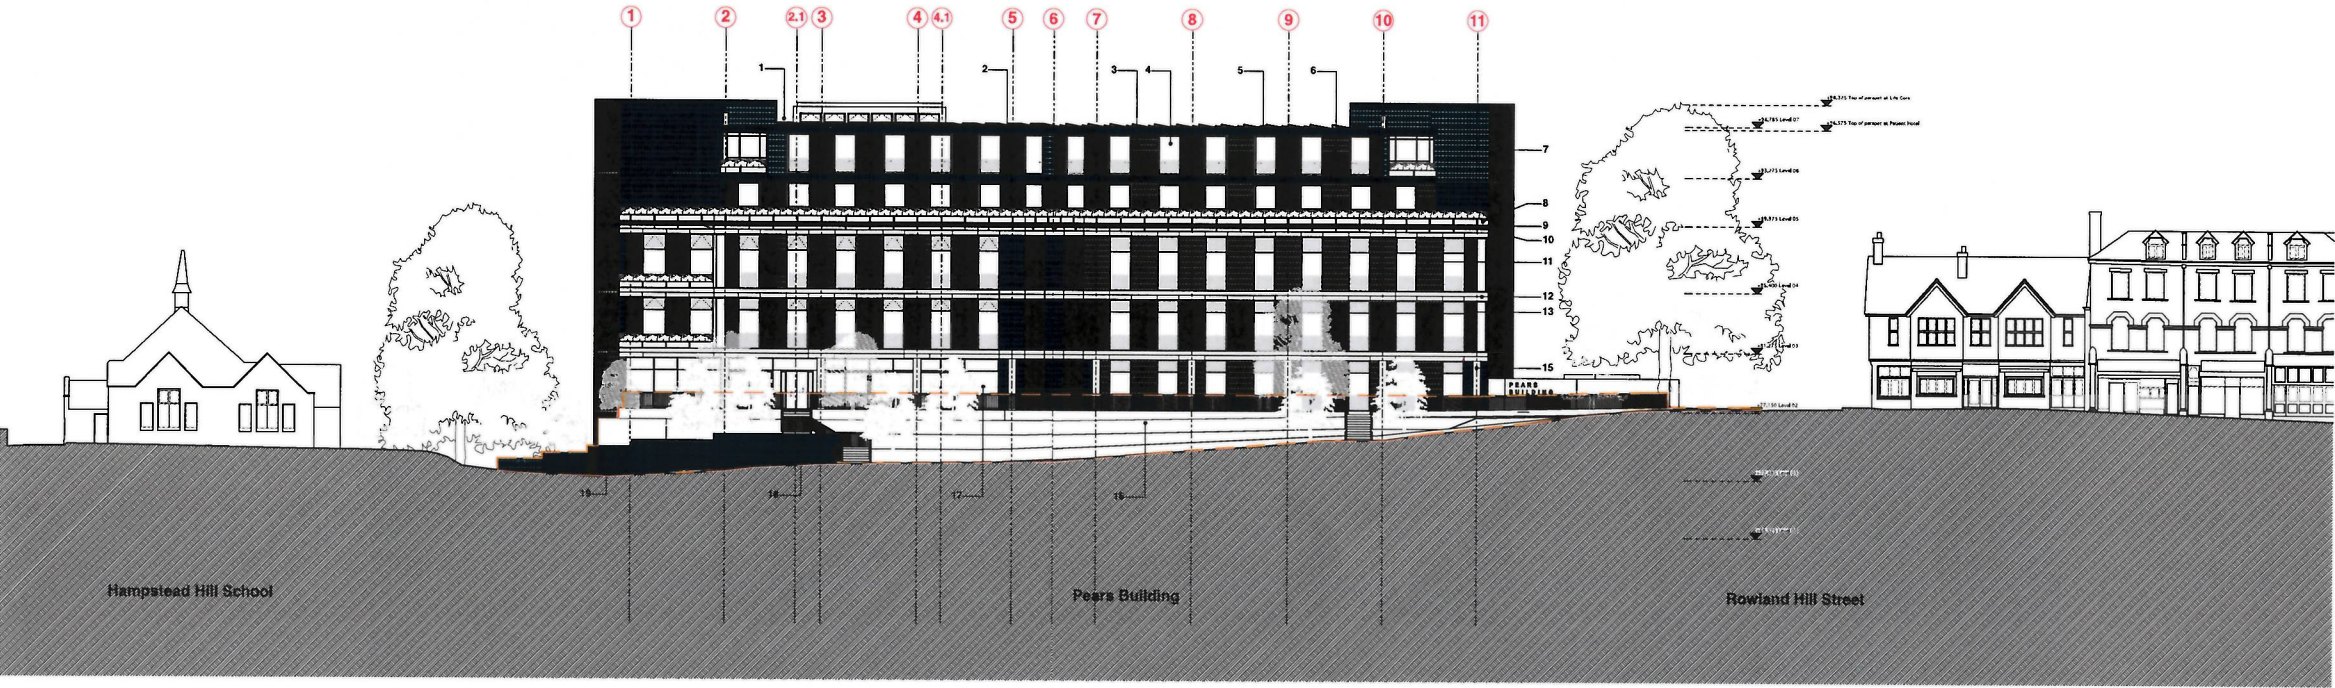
Extract of Section 5.8 of the originally submitted Design and Access Statement - Elevations and Materials
